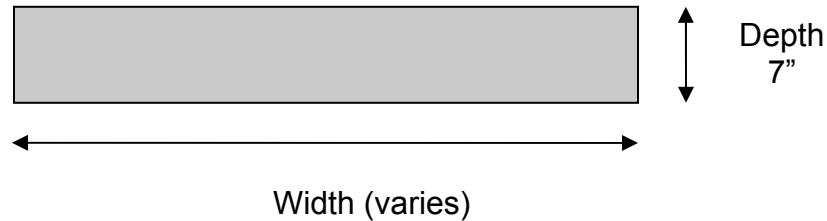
Prestressed Concrete Beam Bridge Deck Section
